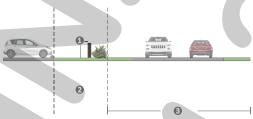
ALTERNATIVE #1 [HEADLIGHT SCREENING USING LANDSCAPING AND A BERM]
